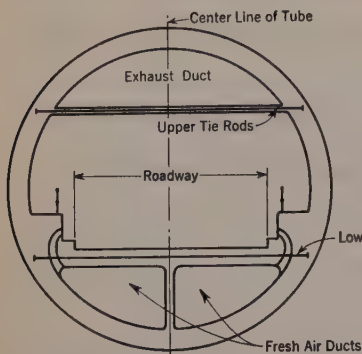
TYPICAL SECTION OF SUB-AQUEOUS TUNNEL TUBE.
